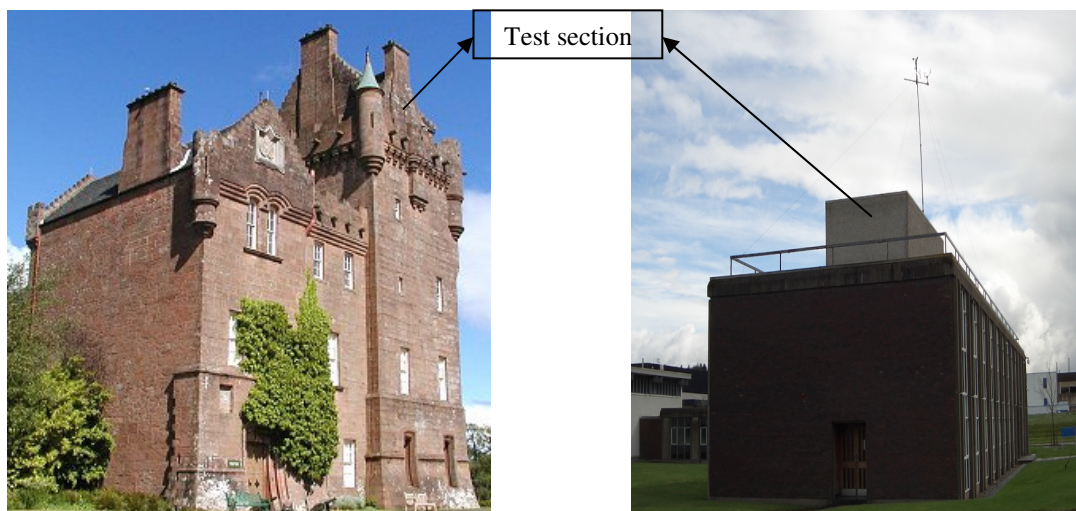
West facing façade, Brodick Castle (L) and BRE building (R)
